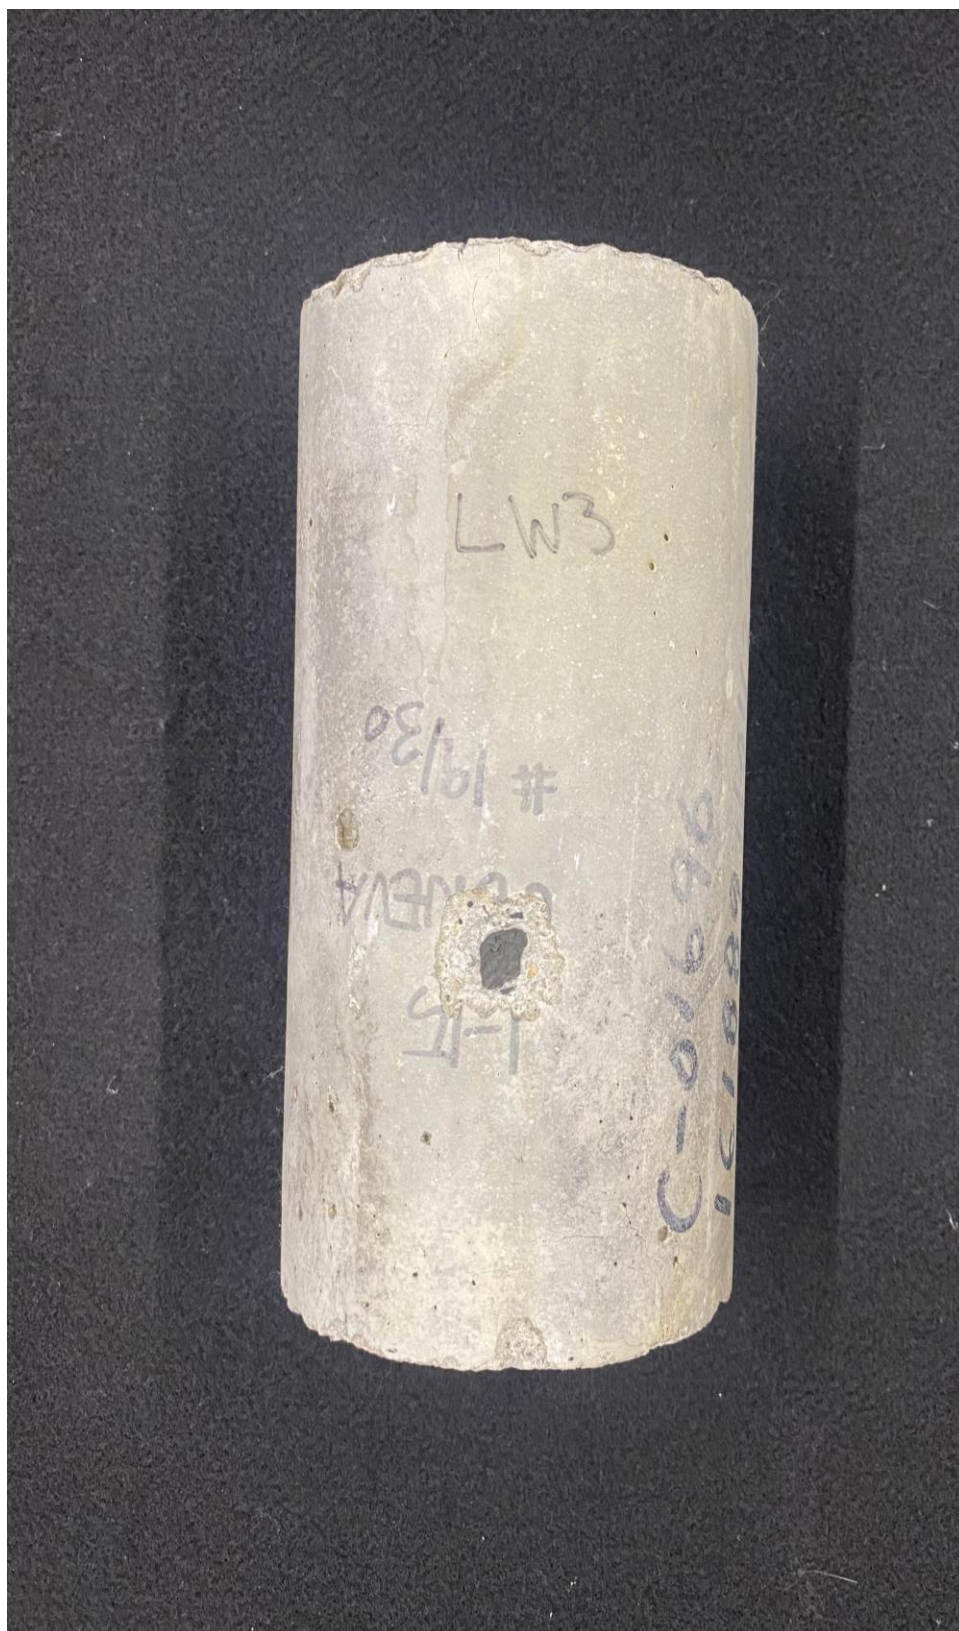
Cylinder 3 of lightweight concrete deck at bridge C-993 (after testing).
